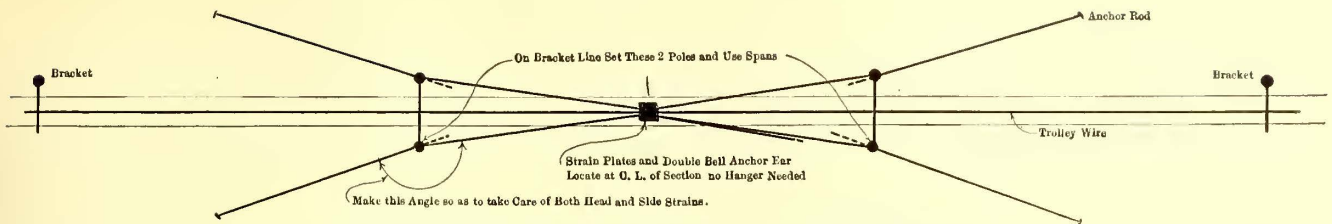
D—Pole Top Construction for Bracket Lines
